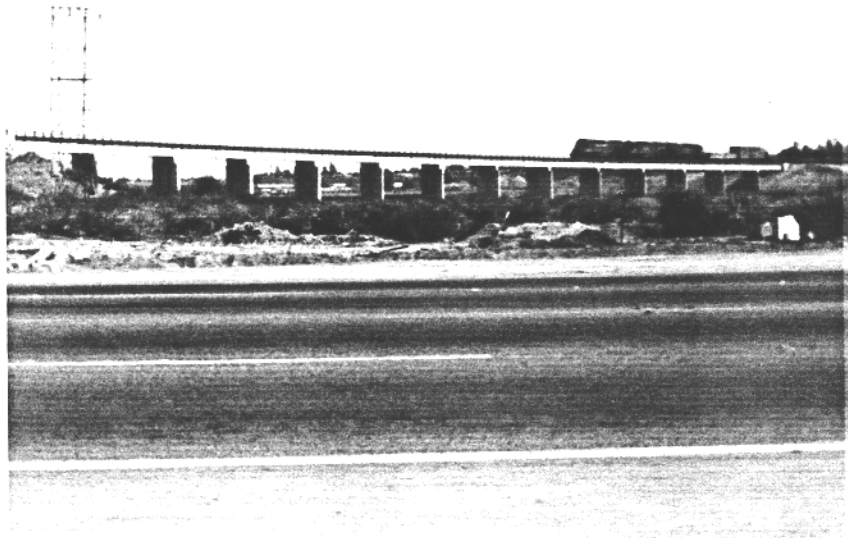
Railroad Crossing Lytle-Cajon Drainage At Highland Avenue Looking South With Island Levee At Right Embankment.
